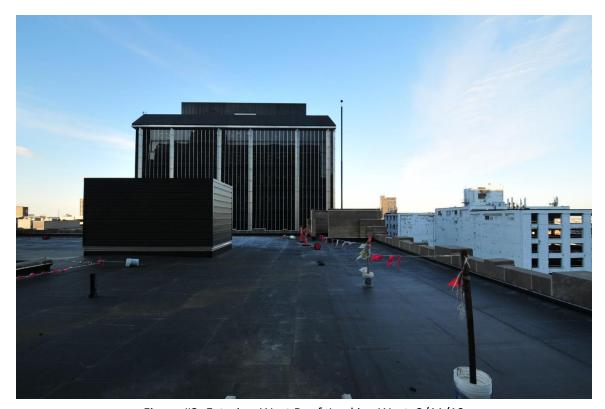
Exterior, West Roof, Looking West. 3/11/19
